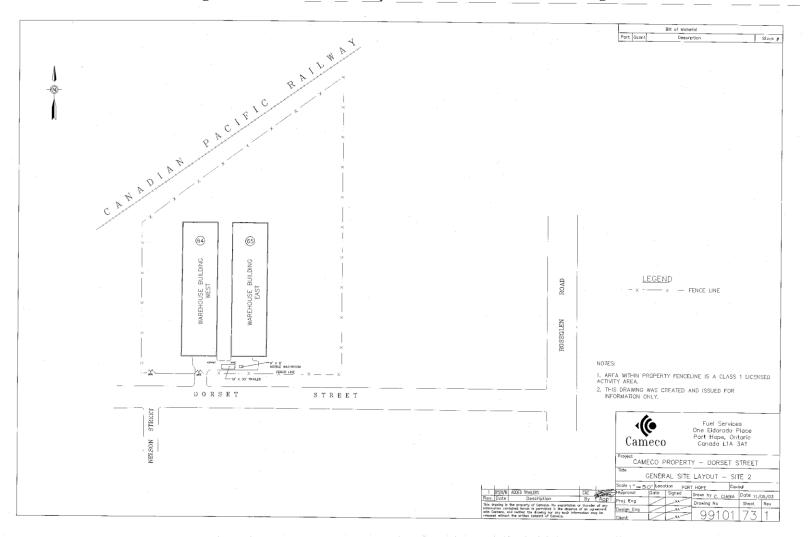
General Plant Layout – Site 2 Dorset Street Storage
